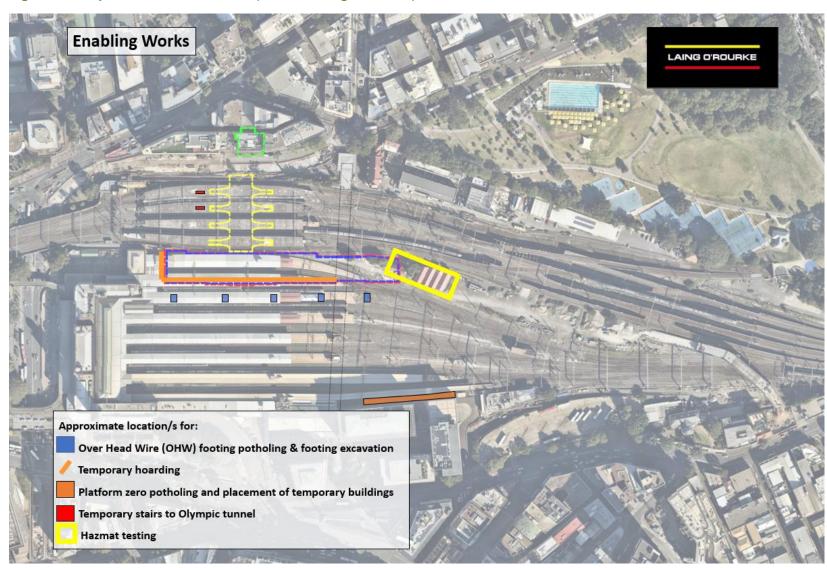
Proposed location of works (Source: Laing O'Rourke).
